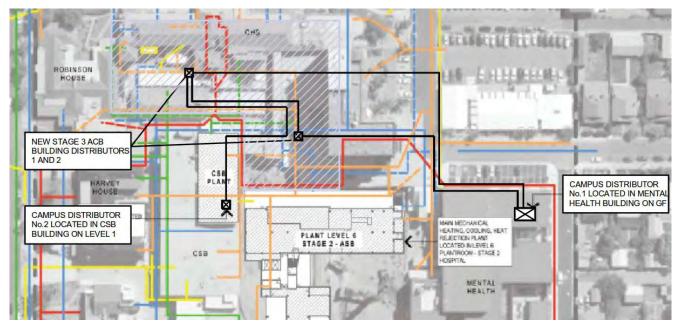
Proposed ICT site infrastructure cable routes relevant to the connectivity of the Stage 3 ACB To achieve this the following will be carried out:
